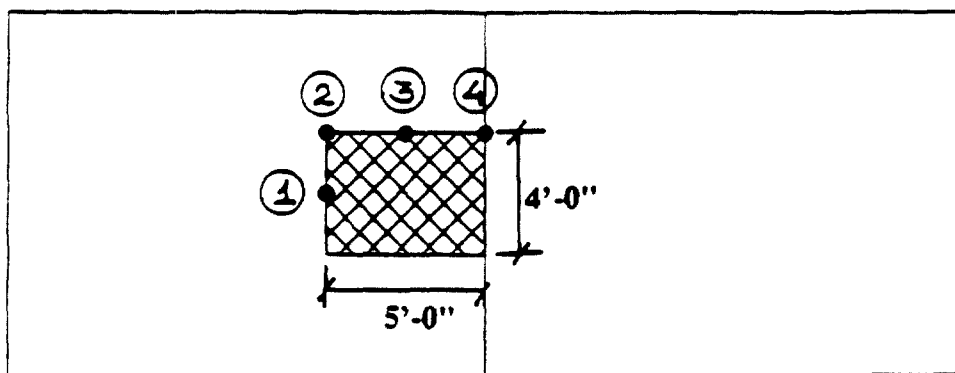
Location and Loading of Edge Cut at Interior Joint
